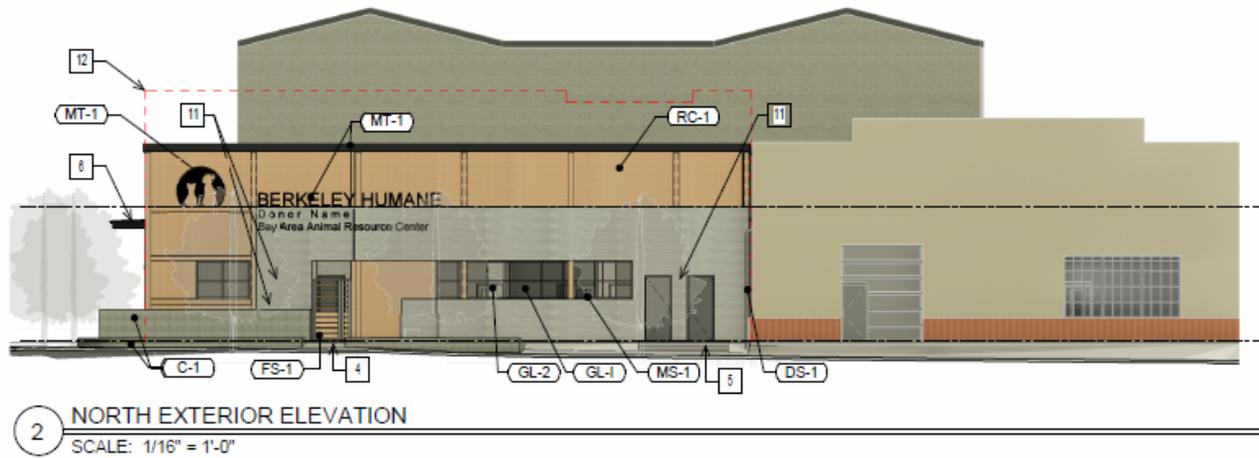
North Elevation along Carleton Street Approved in 2015, UP2013-0055
